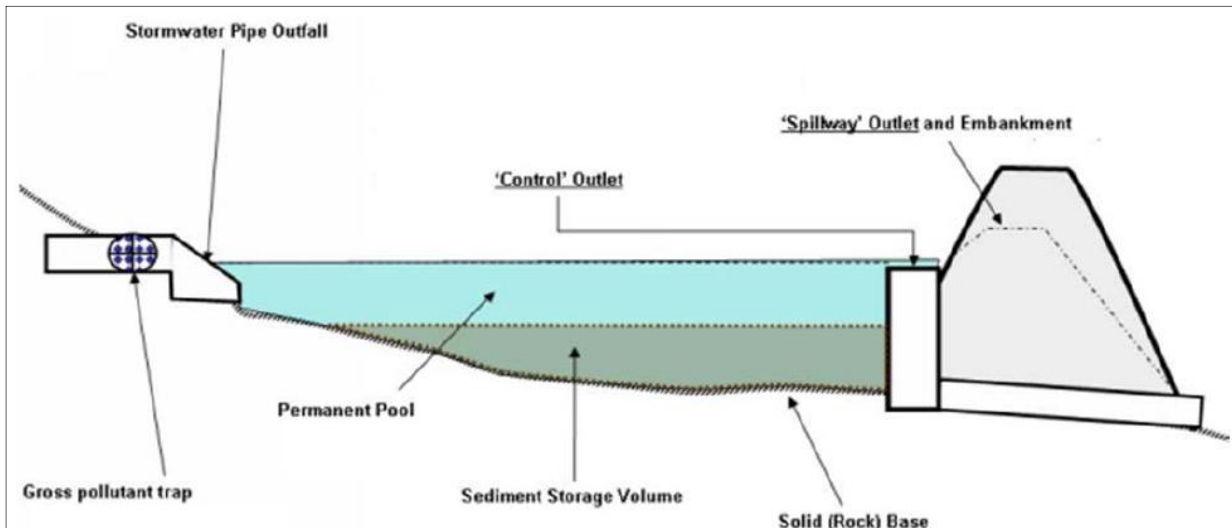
Cross-section of proposed sedimentation pond system (Thyssenkrupp, 2017)
